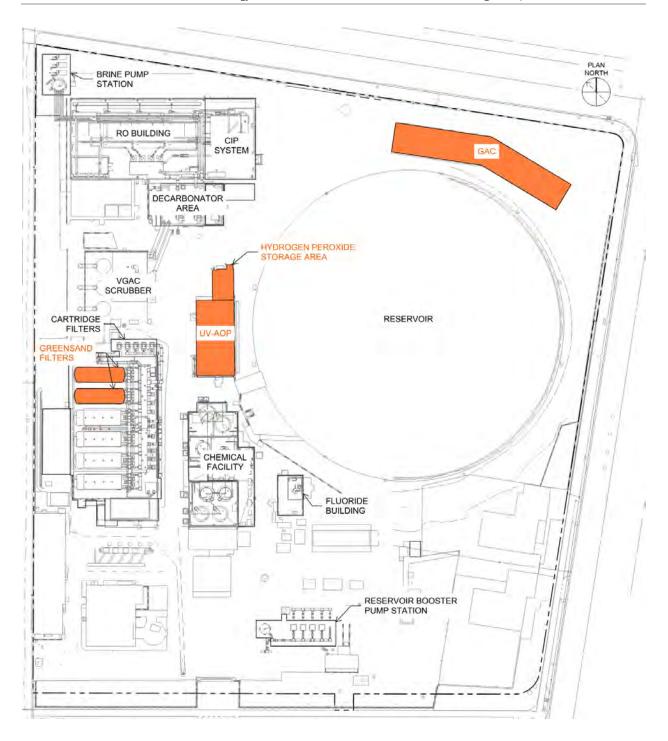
Olympic AWTF and Arcadia WTP expansion site plan $\,$
